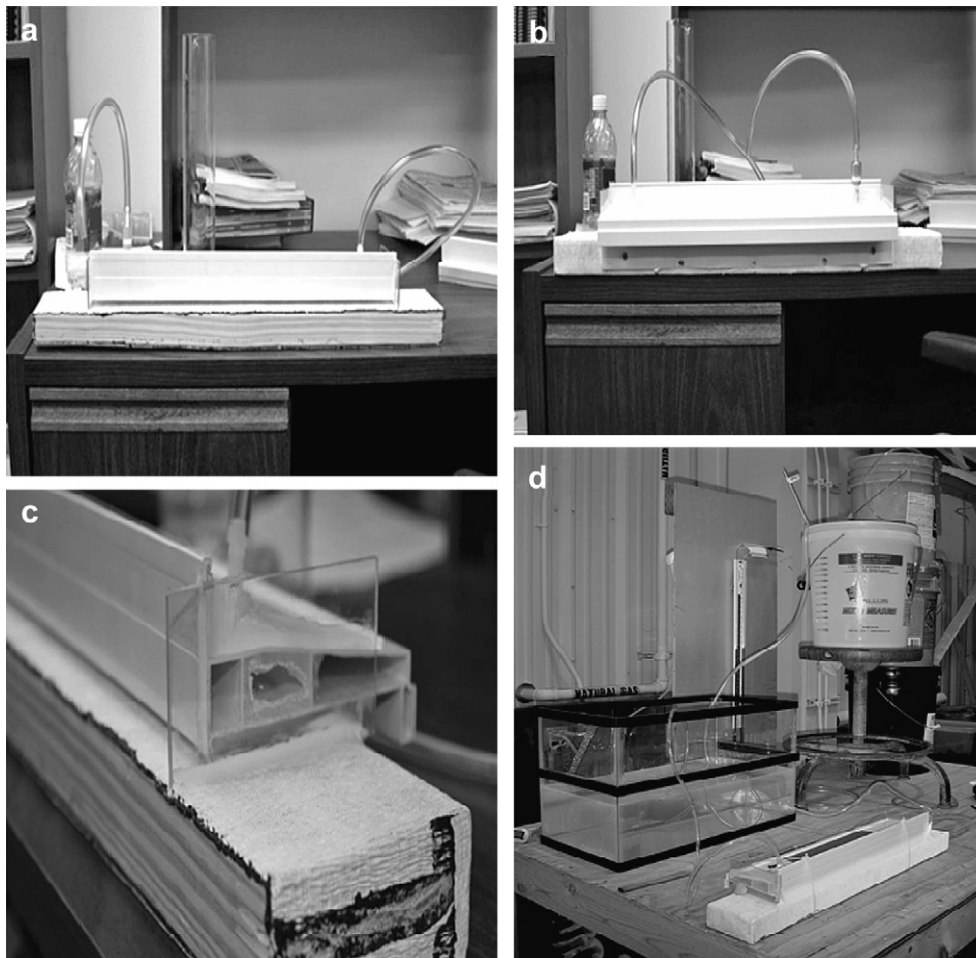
Sill specimen for hydraulic leakage pressure test. (a) Sill specimen mounted to maintain 6.4 mm (1/4 in) gap for seal. (b) Sill extrusion affixed to mock-sill with screws through mounting flange. (c) Ends of specimens sealed to hold water inside sill cavity. (d) Hydraulic leakage pressure testing apparatus.
